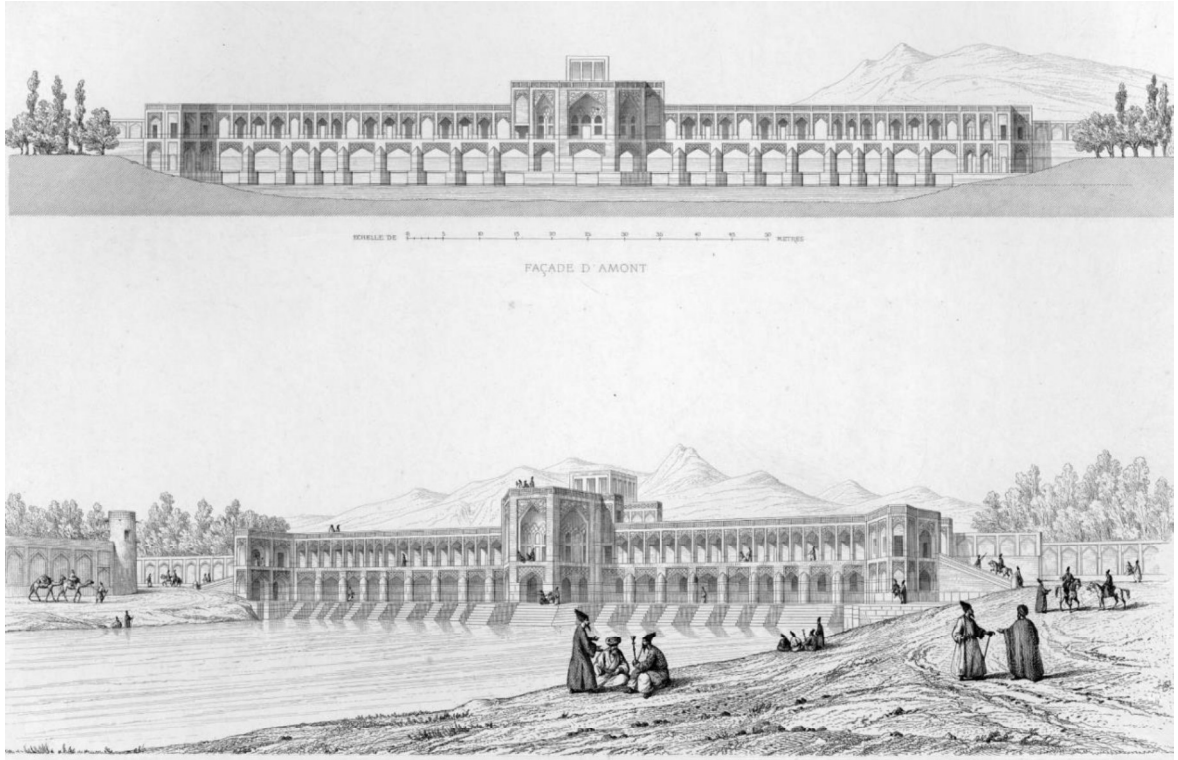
Khaju bridge façade, Pascale Coste painting, 1840, upload.wikimedia.org
